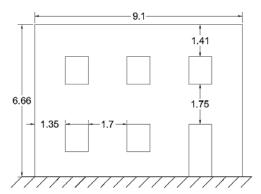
Typical facade of 2-story masonry building with spandrels and piers (measurements are in meter).
